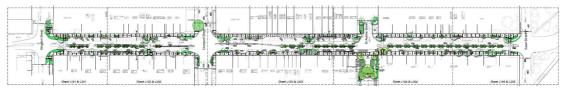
Key Plan of the overall landscape works on Kelly Street. (MARA Consulting P/L)
